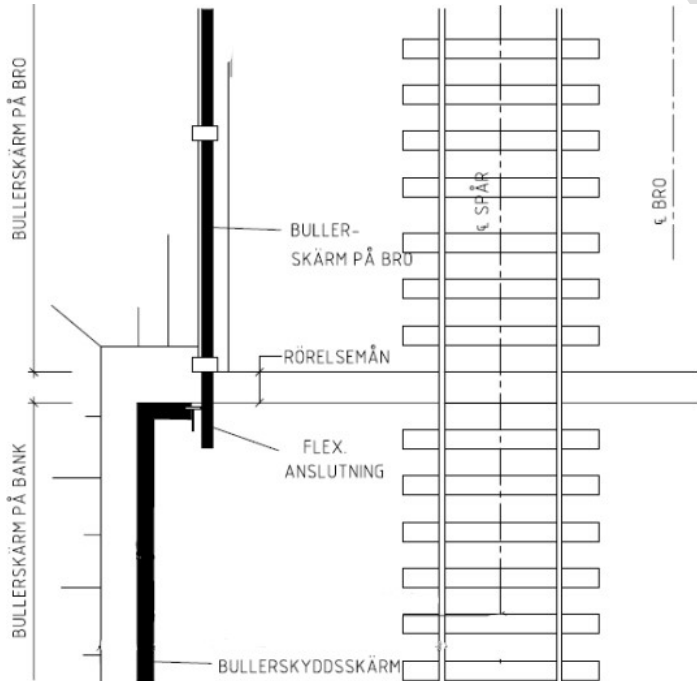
3 Plan view of noise barrier on embankment, connection to bridge. Note: the figure shows a principle, not a technical solution.
